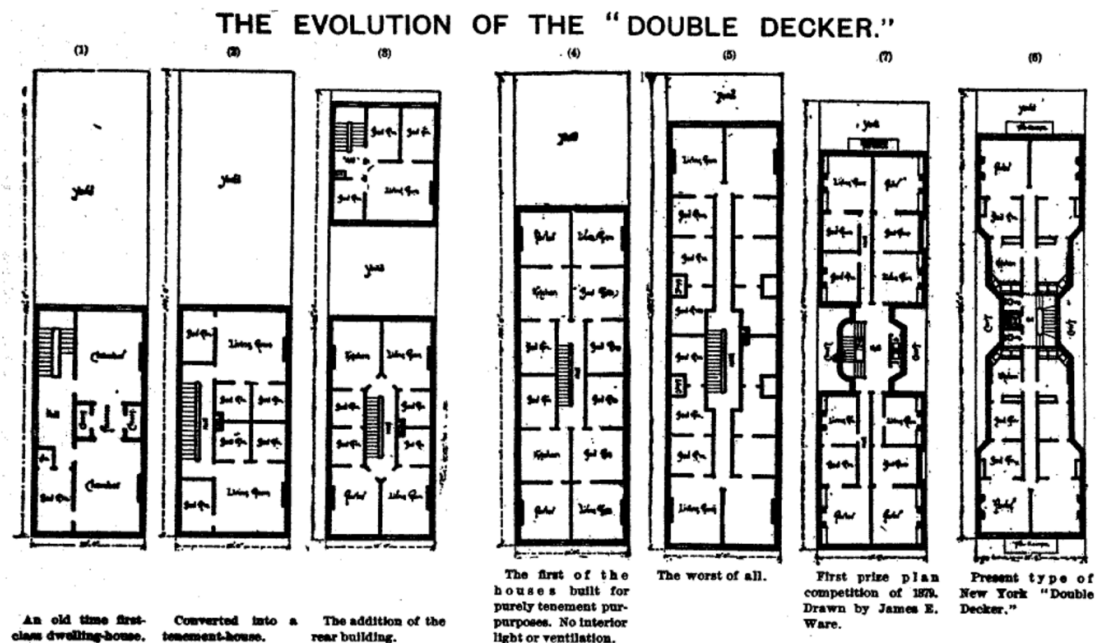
Excerpt from the Report of the Tenement House Committee as authorized by Chapter 479 of the Laws of 1894, with the typical "dumbbell" floorplan of the era on the right¹⁴
